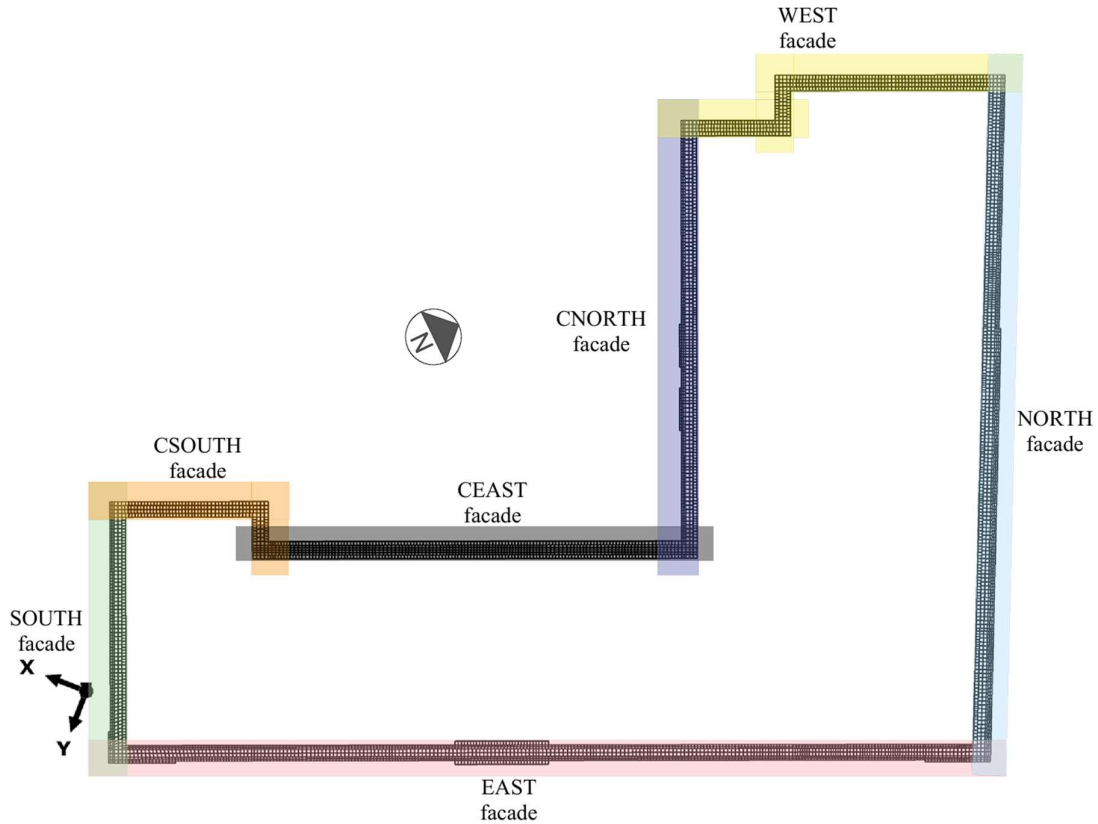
Model mesh of Palazzo Campana's perimetral facades, top view and facade nomenclature
